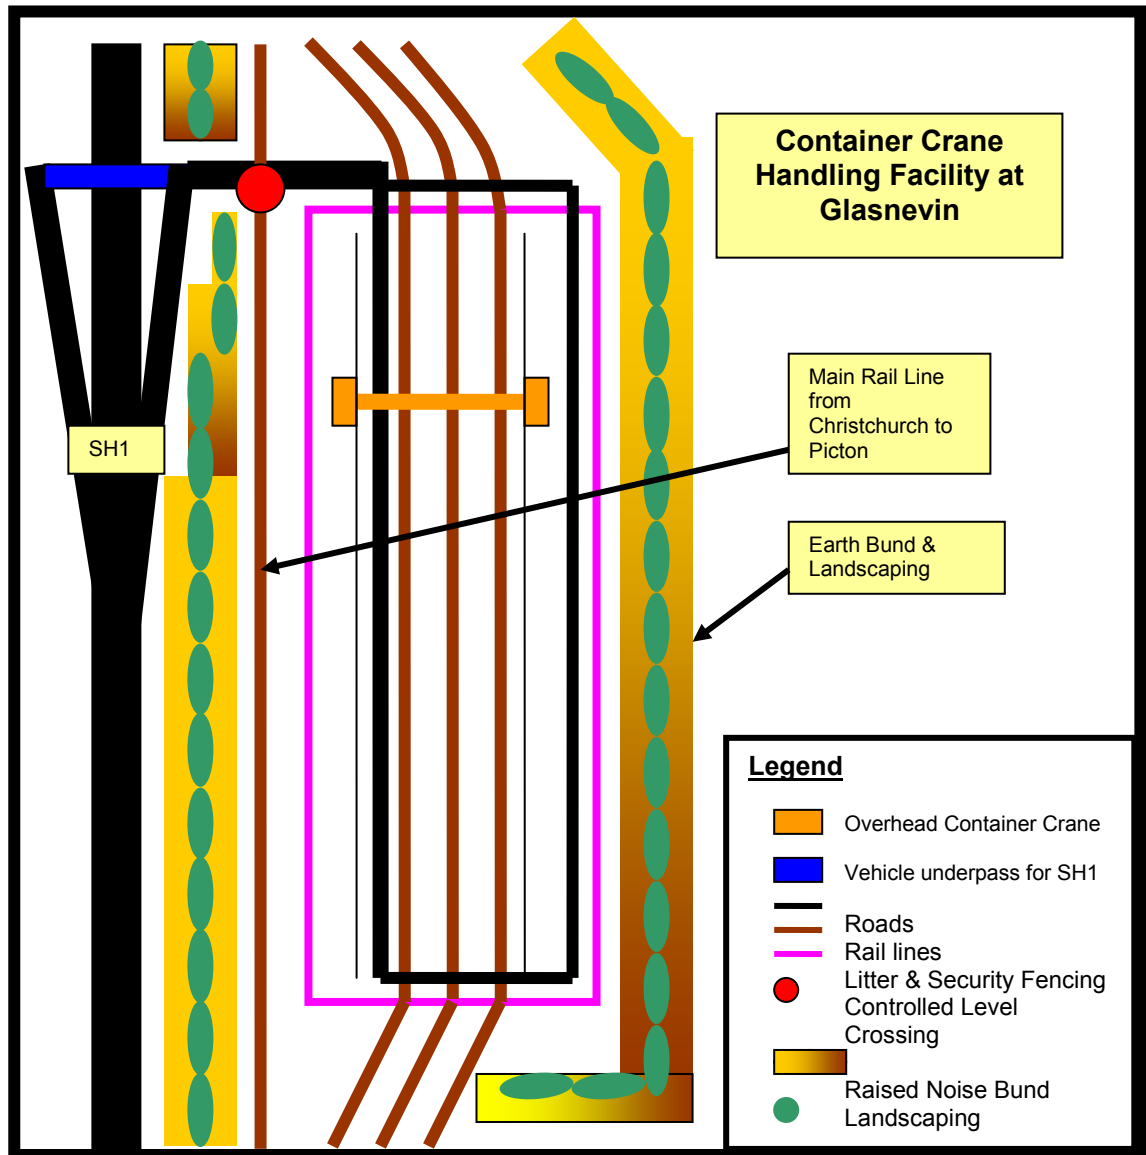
Proposed Layout of the Overhead Gantry Crane Rail and Container Handling Facility layout at Glasnevin (Author, 2005).
